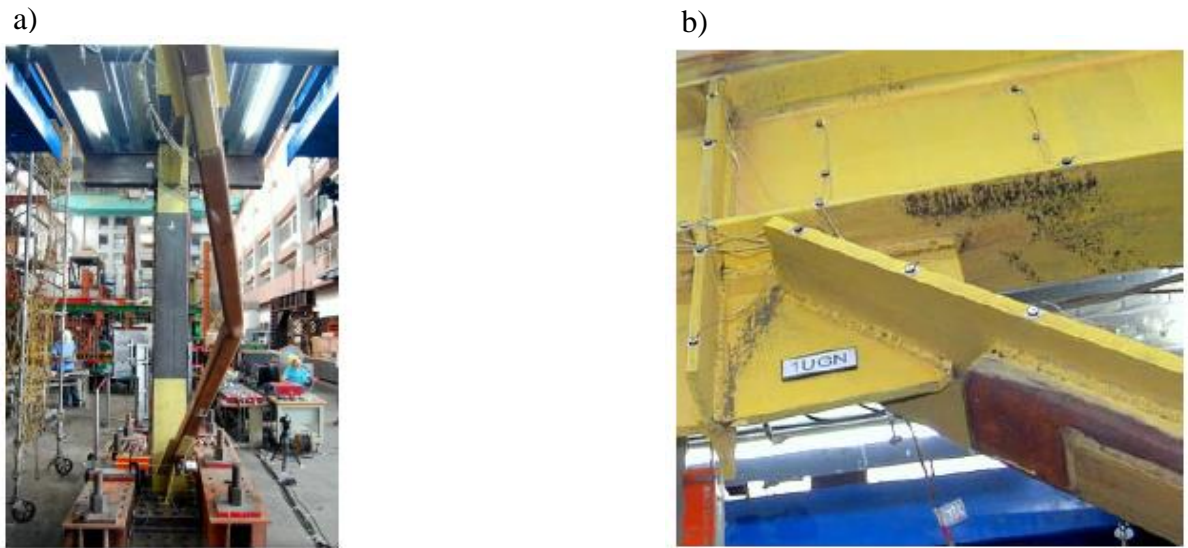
a) Out-of-plane deformation of brace; and b) Bottom beam flange yielding and gusset plate elliptical yielding (Sen et al. 2014).
